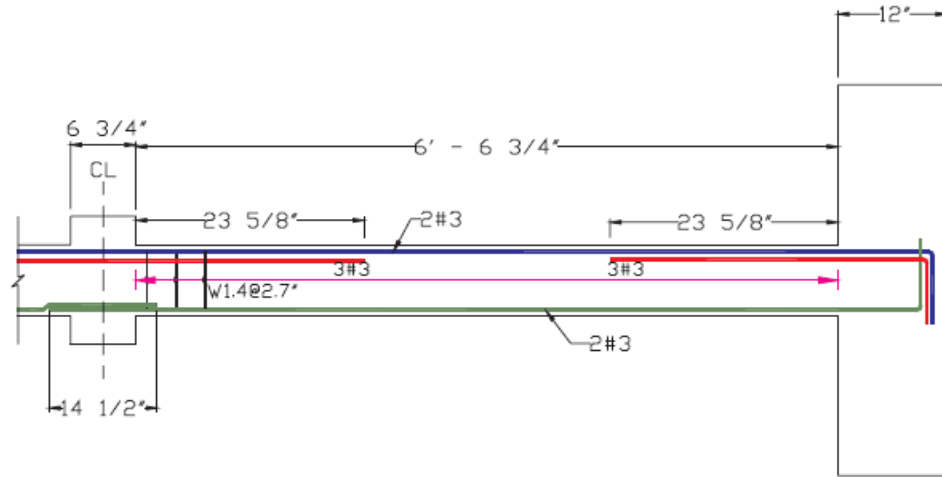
Reinforcement detailing of tested beam (Sasani and Kropelnicki, 2008)
